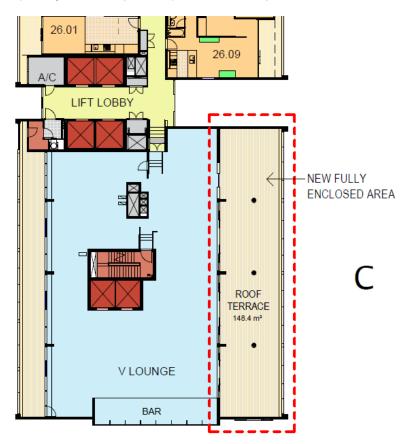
Excerpt from the Level 26 floor plan showing the roof terrace, which is to become fully enclosed area as a result of louvre installation
